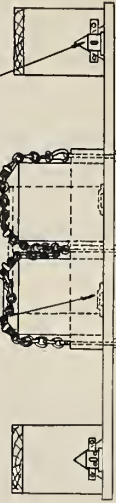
DETAIL OF TOOL BOX END SHOWING HOW CAN RACK HOLDS
